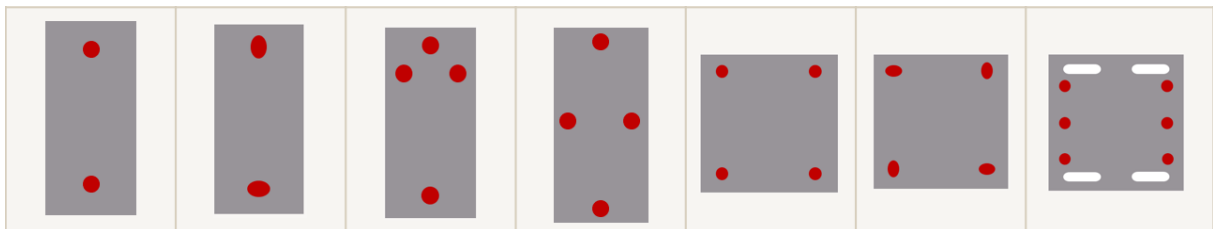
Cross section model of base plates available in Profis MSE.
